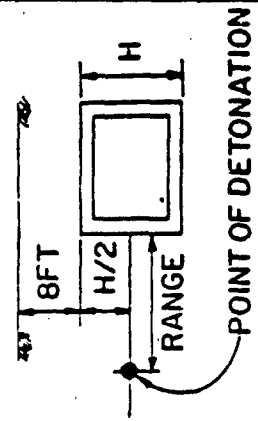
WALL AND ROOF DESIGN FOR CONCRETE/PREFABRICATED BOX SECTION.
